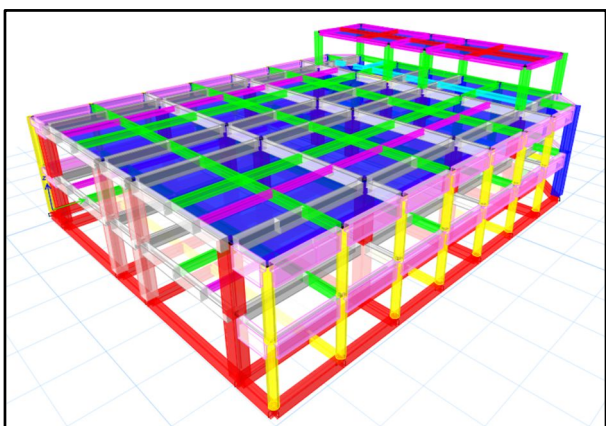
3D structural model of laboratory building zone D (model 3)
